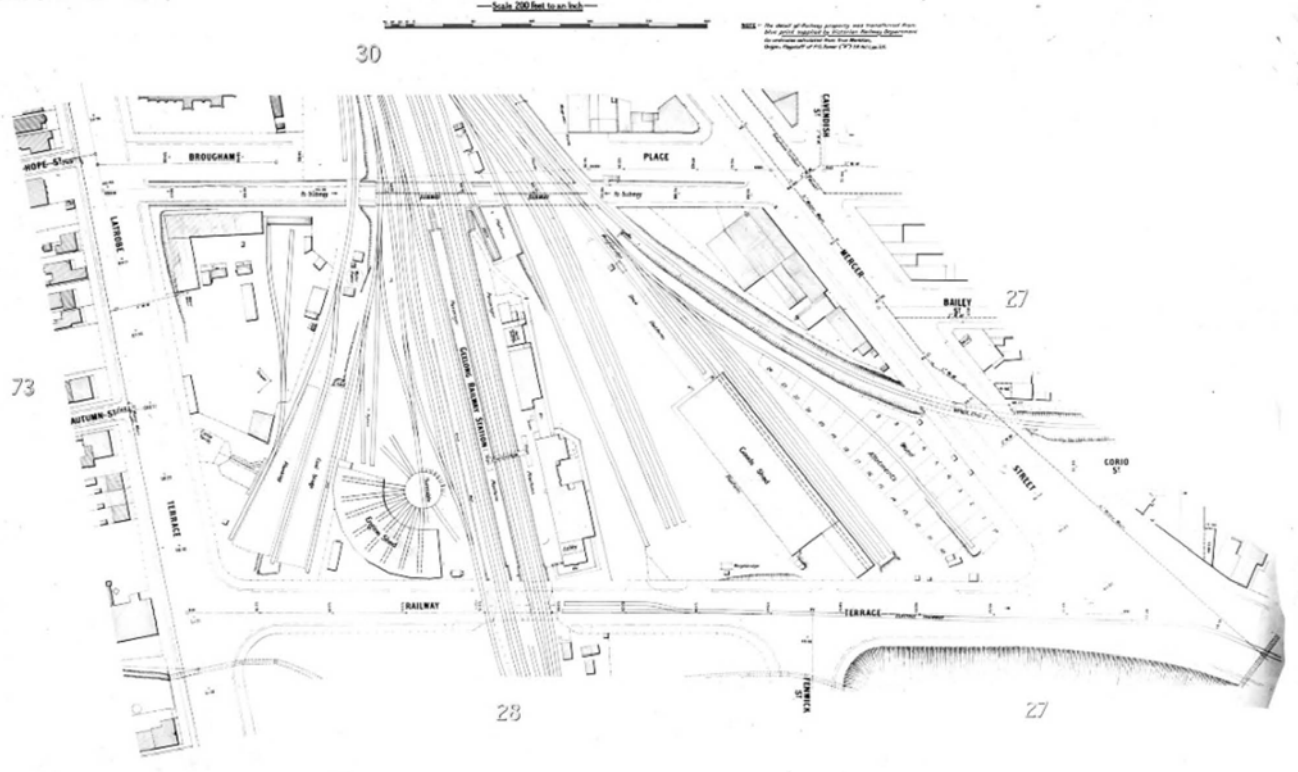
Geelong Waterworks & Sewerage Trust Detail Plan No. 29, n.d., showing layout of Geelong Railway Terminus including circular locomotive turntable & engine shed built in 1887. Source: Barwon Water.
